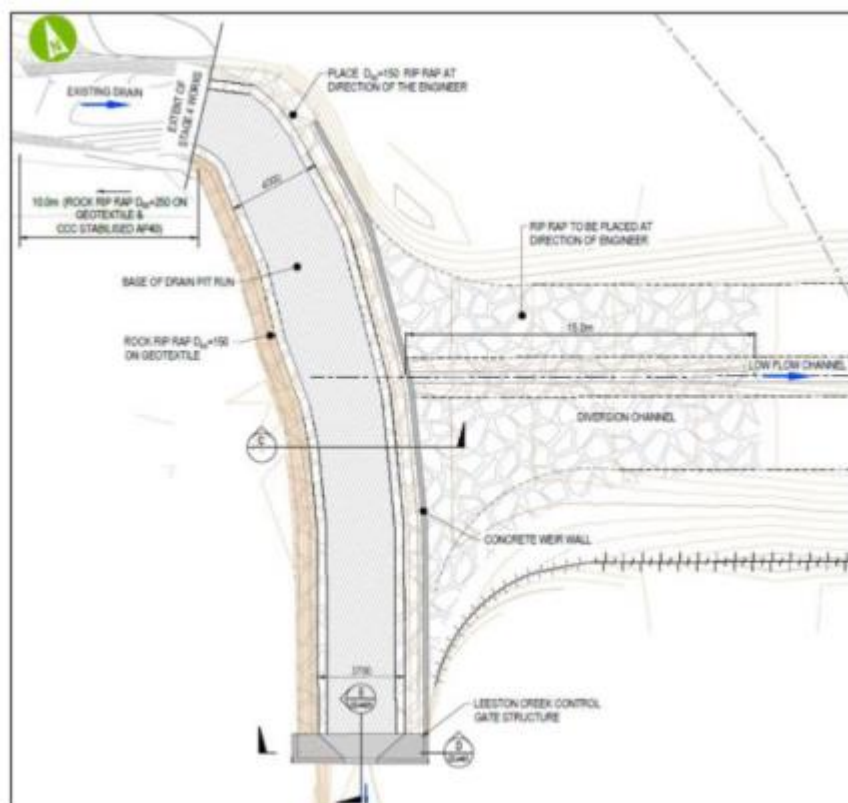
Concept Plan of the Proposed Diversion Structure between Leeston Creek and the Stormwater Bypass Channel
